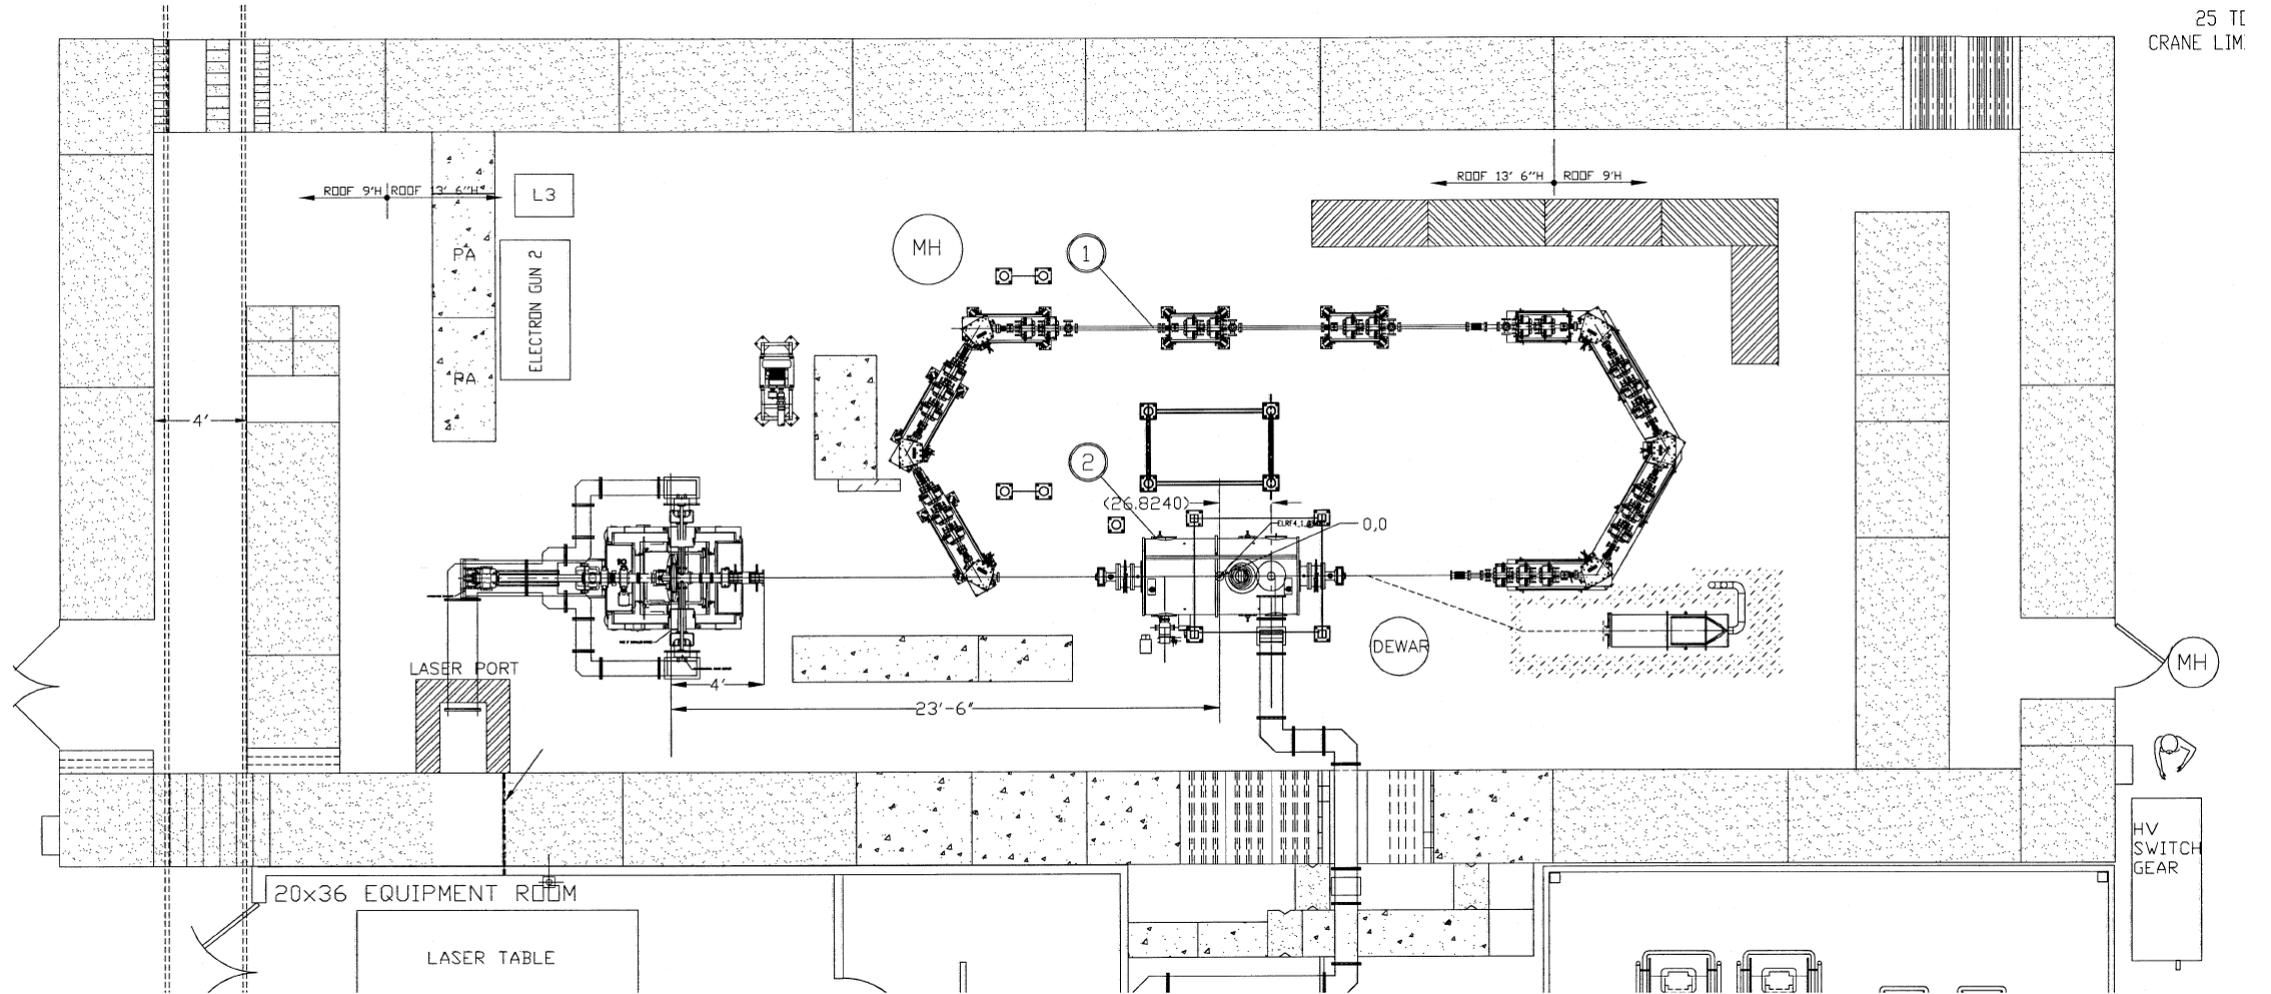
d Drawing of Prototype ERL Laser, Klystron and Power Supply Rooms
